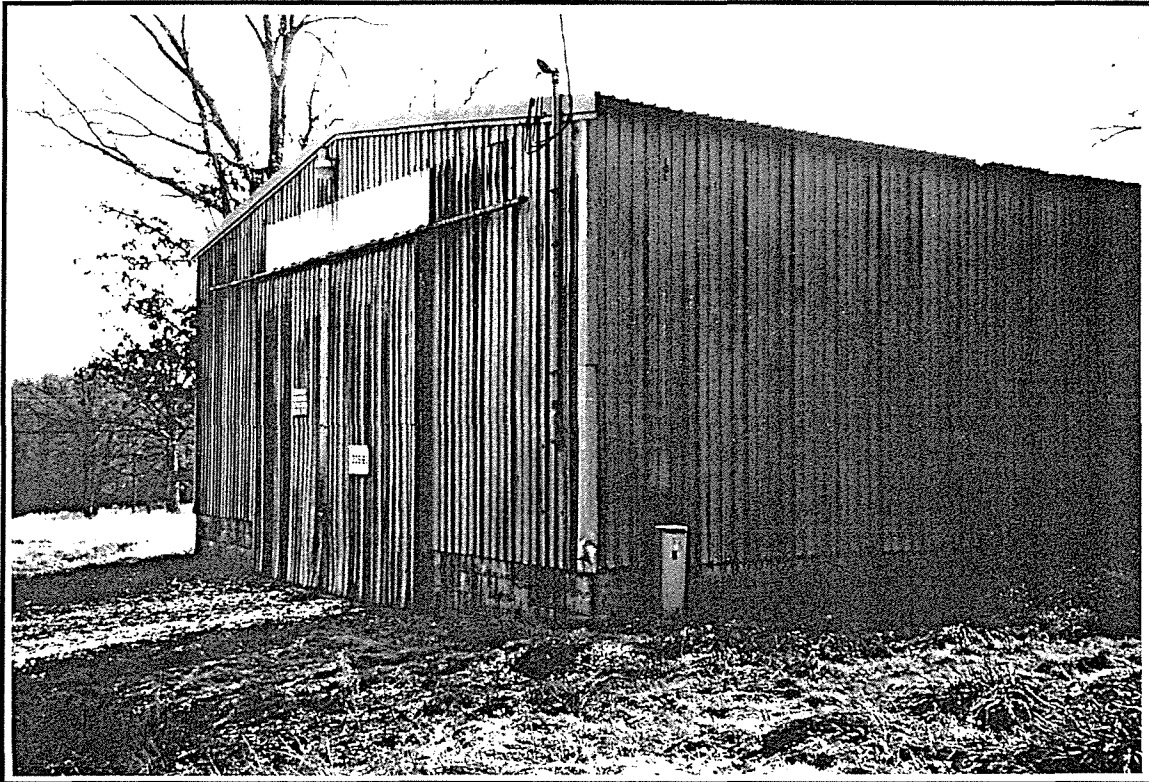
Photo ID: Building 335-B-1, South and East Elevations, 12/97
